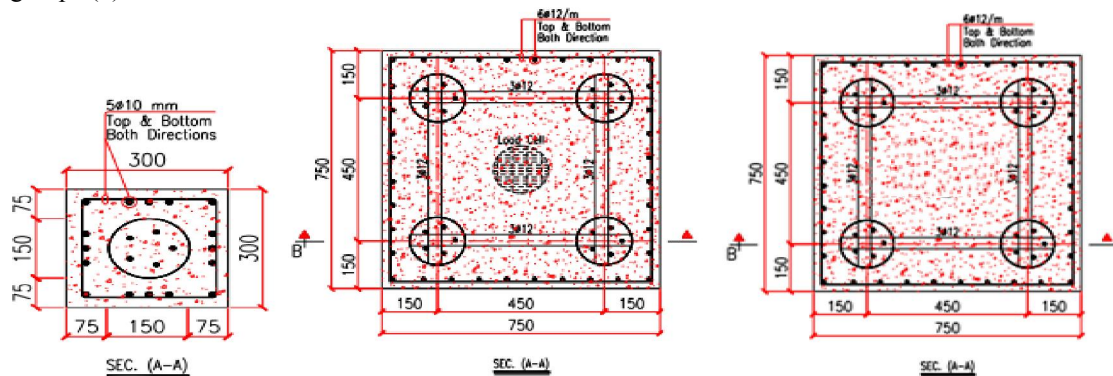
Reinforcement Concrete details for single pile–group (1), Piled-raft directly in contact with soil for four piles -groups (2) as well as Piled-raft freestanding for four piles-groups (3) (all dimensions in mm).
